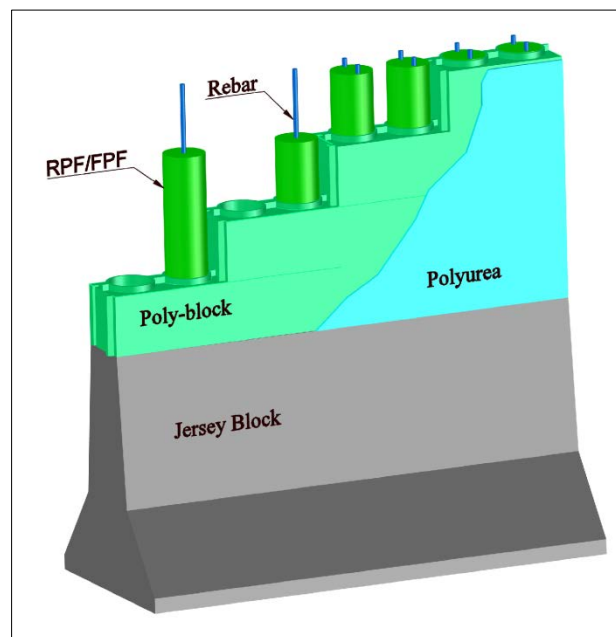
Poly-wall/flexi-wall structural system built on concrete block
